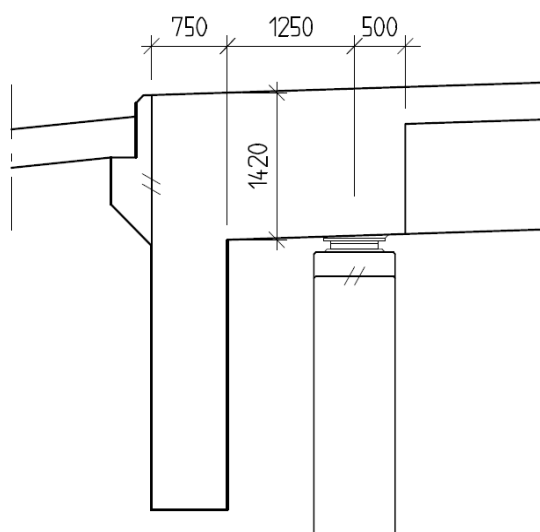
Detail of the transversal support beam of bridge 16-935-1 at Axvalla over road 49. Adapted from Batman (2010).
